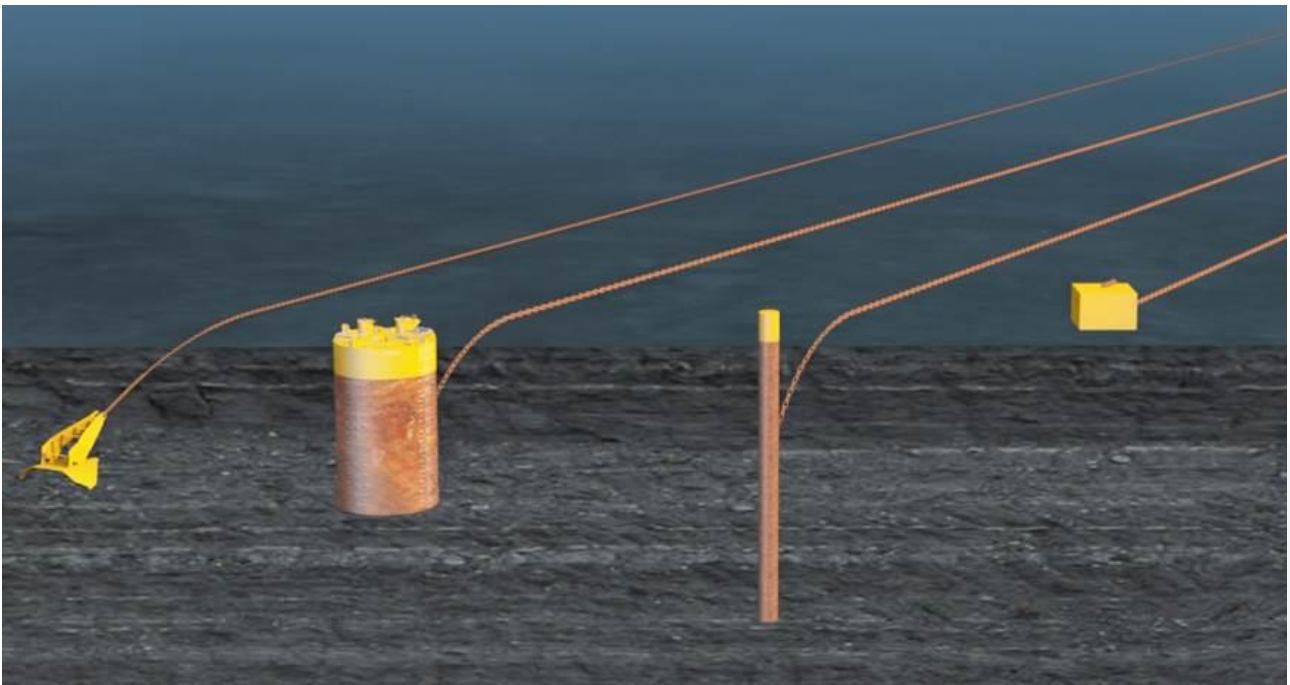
Potential anchoring solutions considered for the Offshore Proposed Development (from the left, drag embedment anchors, suction caissons, grouted piles and gravity-based anchors)
